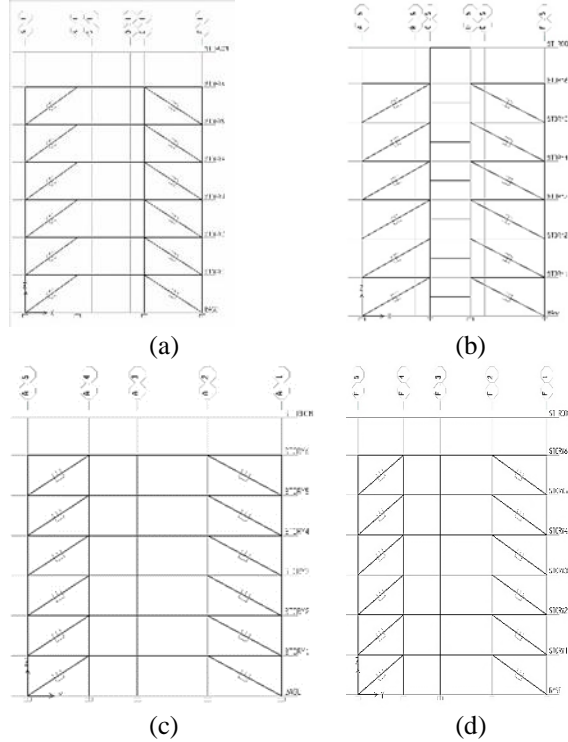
Location of dampers in the 1 + 5-floor building for a) frame 1, b) frame 5, c) frame A, d) frame F
